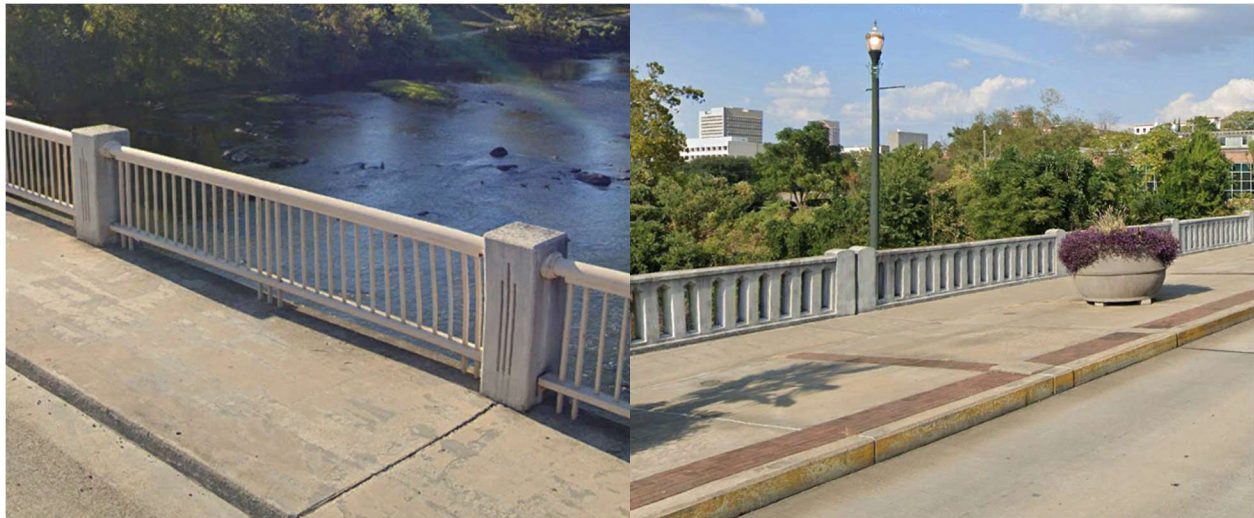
Blossom Street over Congaree River Railing (Top Left) and Lady Street over CSXT and Norfolk Southern Railroads (Top Right)
